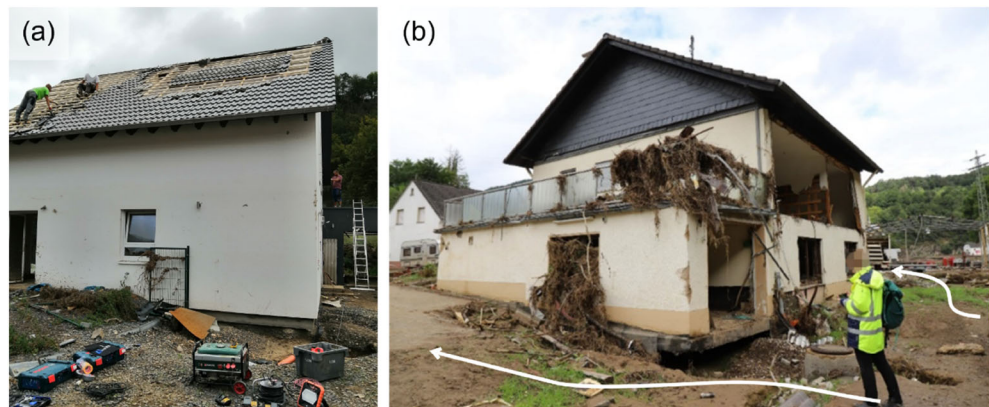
Damaged building in (a) Kreuzberg and (b) Brück, where scour at the corner reached the foundation. In (b) debris accumulation can also be observed.
